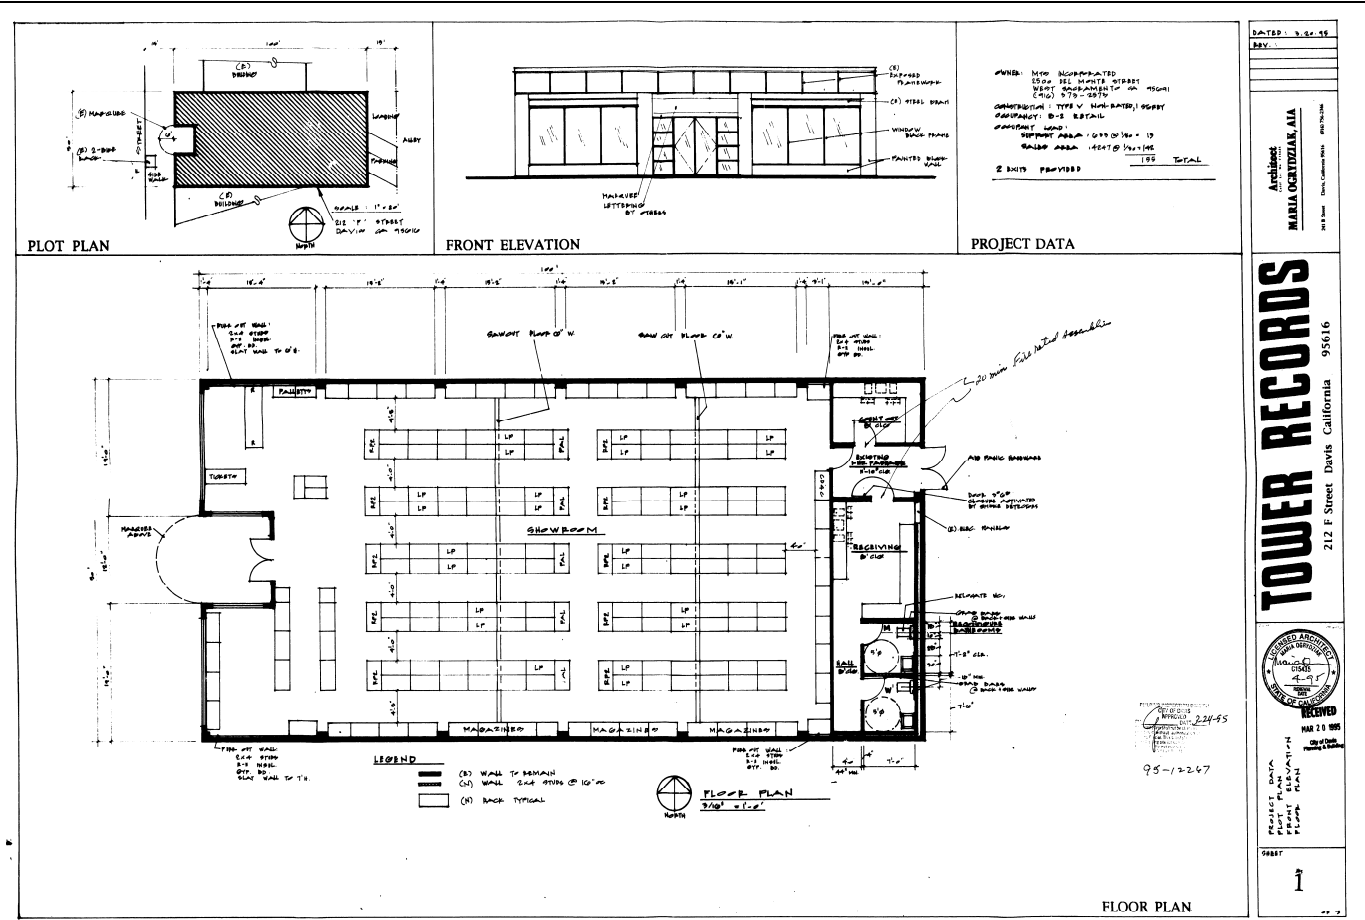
1995 Floor Plan for Tower Records, Maria Ogrzydziak AIA (architect)
